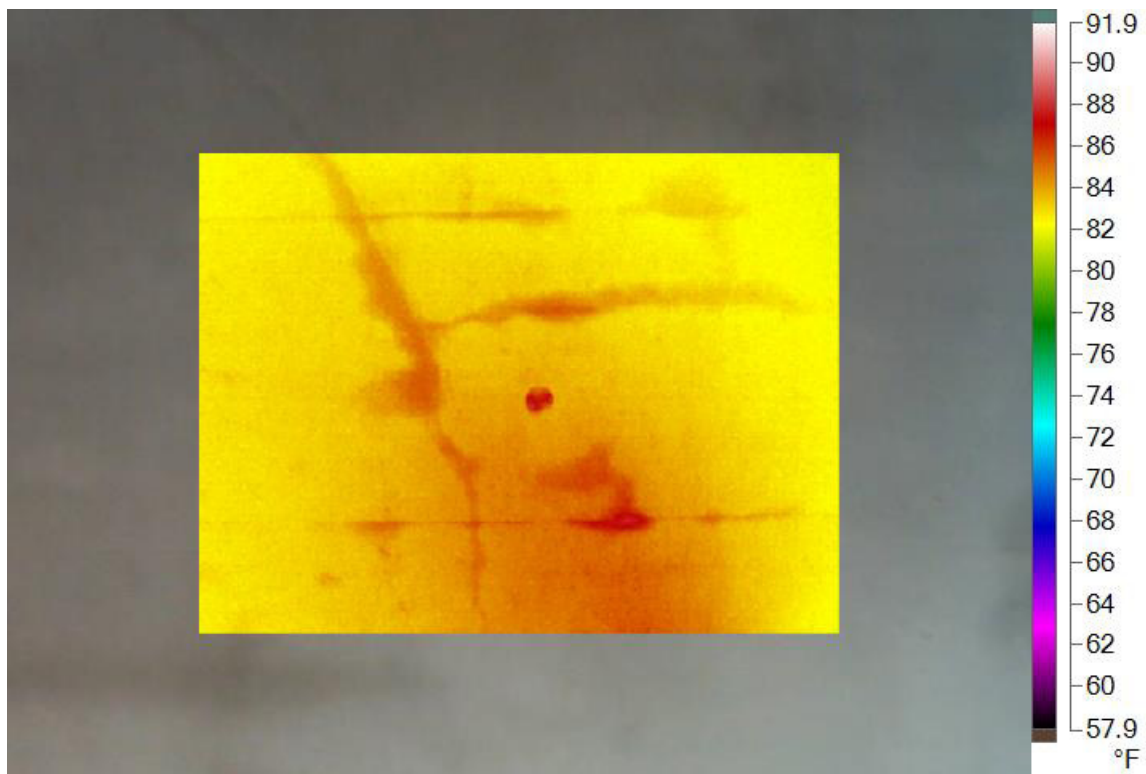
Southeast chamber, ceiling: Analysis of ceiling indicated cracking obscured by wallpaper. Note: Horizontal lines denote edges of individual sheets of wallpaper.
